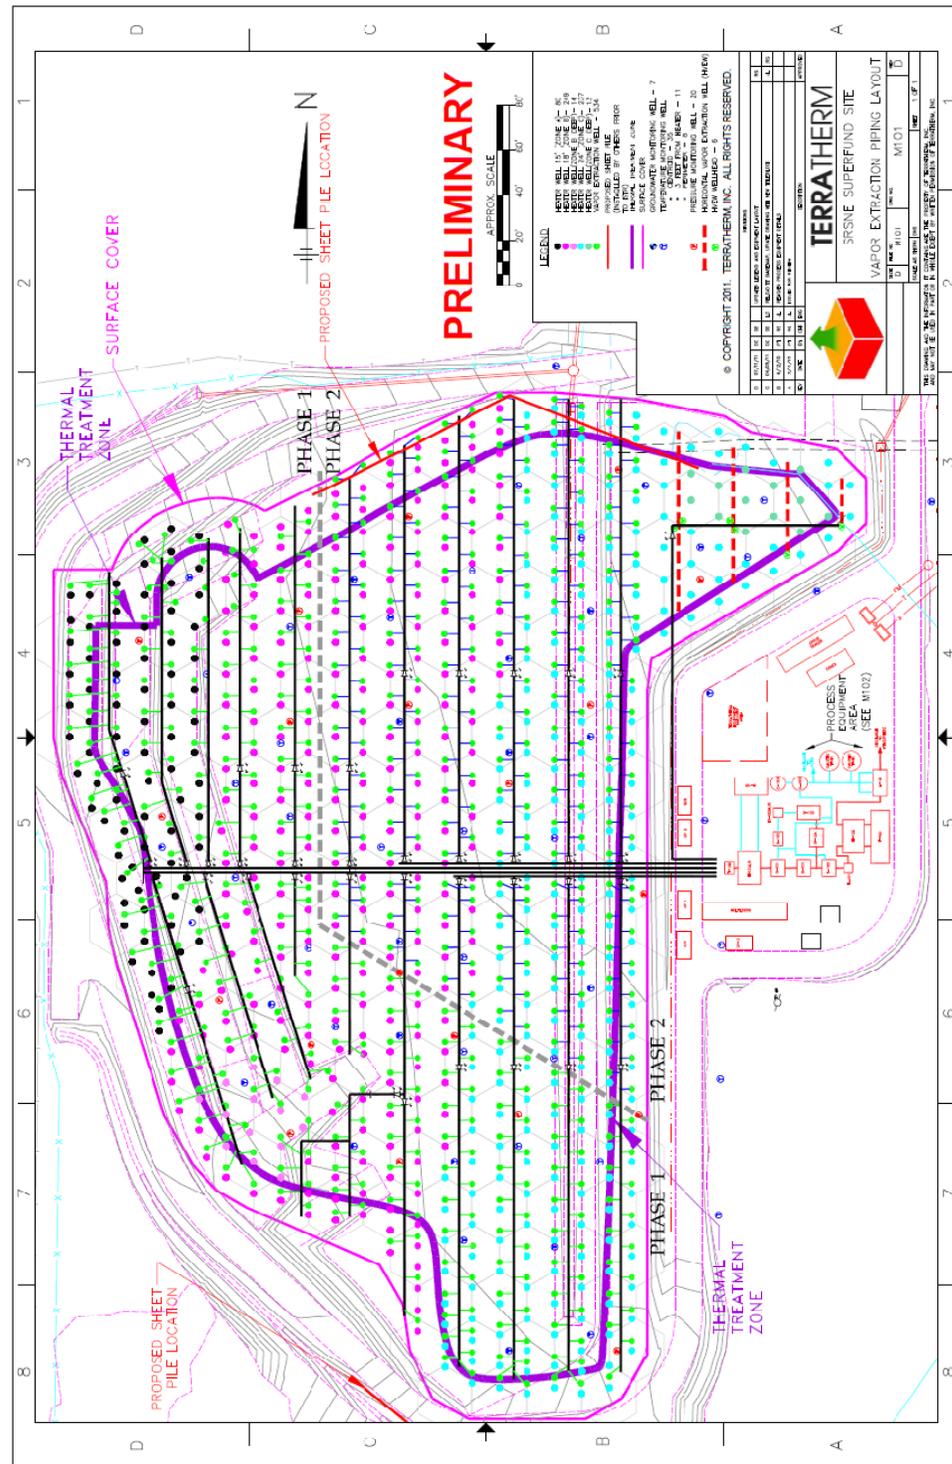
SRSNE Superfund Site Piping and Equipment Detail (M101)
